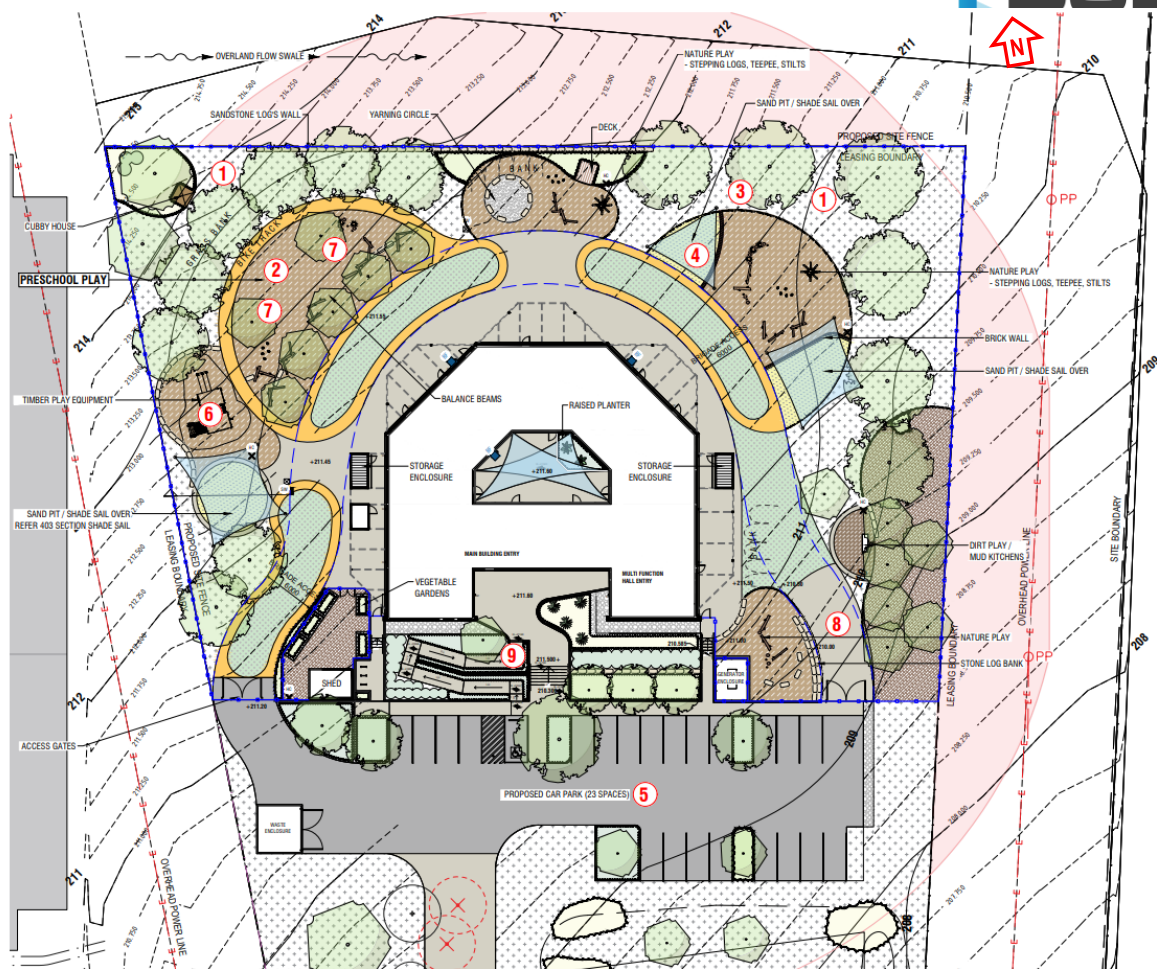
Proposed Outdoor Landscaping Drawing ('General Arrangement Plan' by Harris Hobbs Landscapes)
